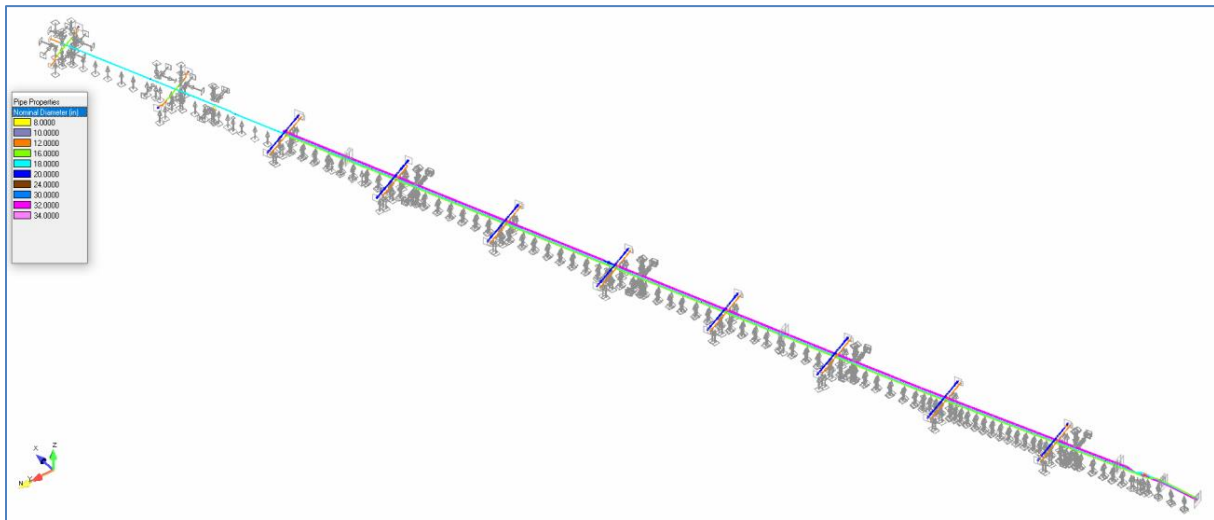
Lower Access Tunnel Piping Configuration. Tank 19 and 20 on the left, Tank 1 and 2 on the right.
